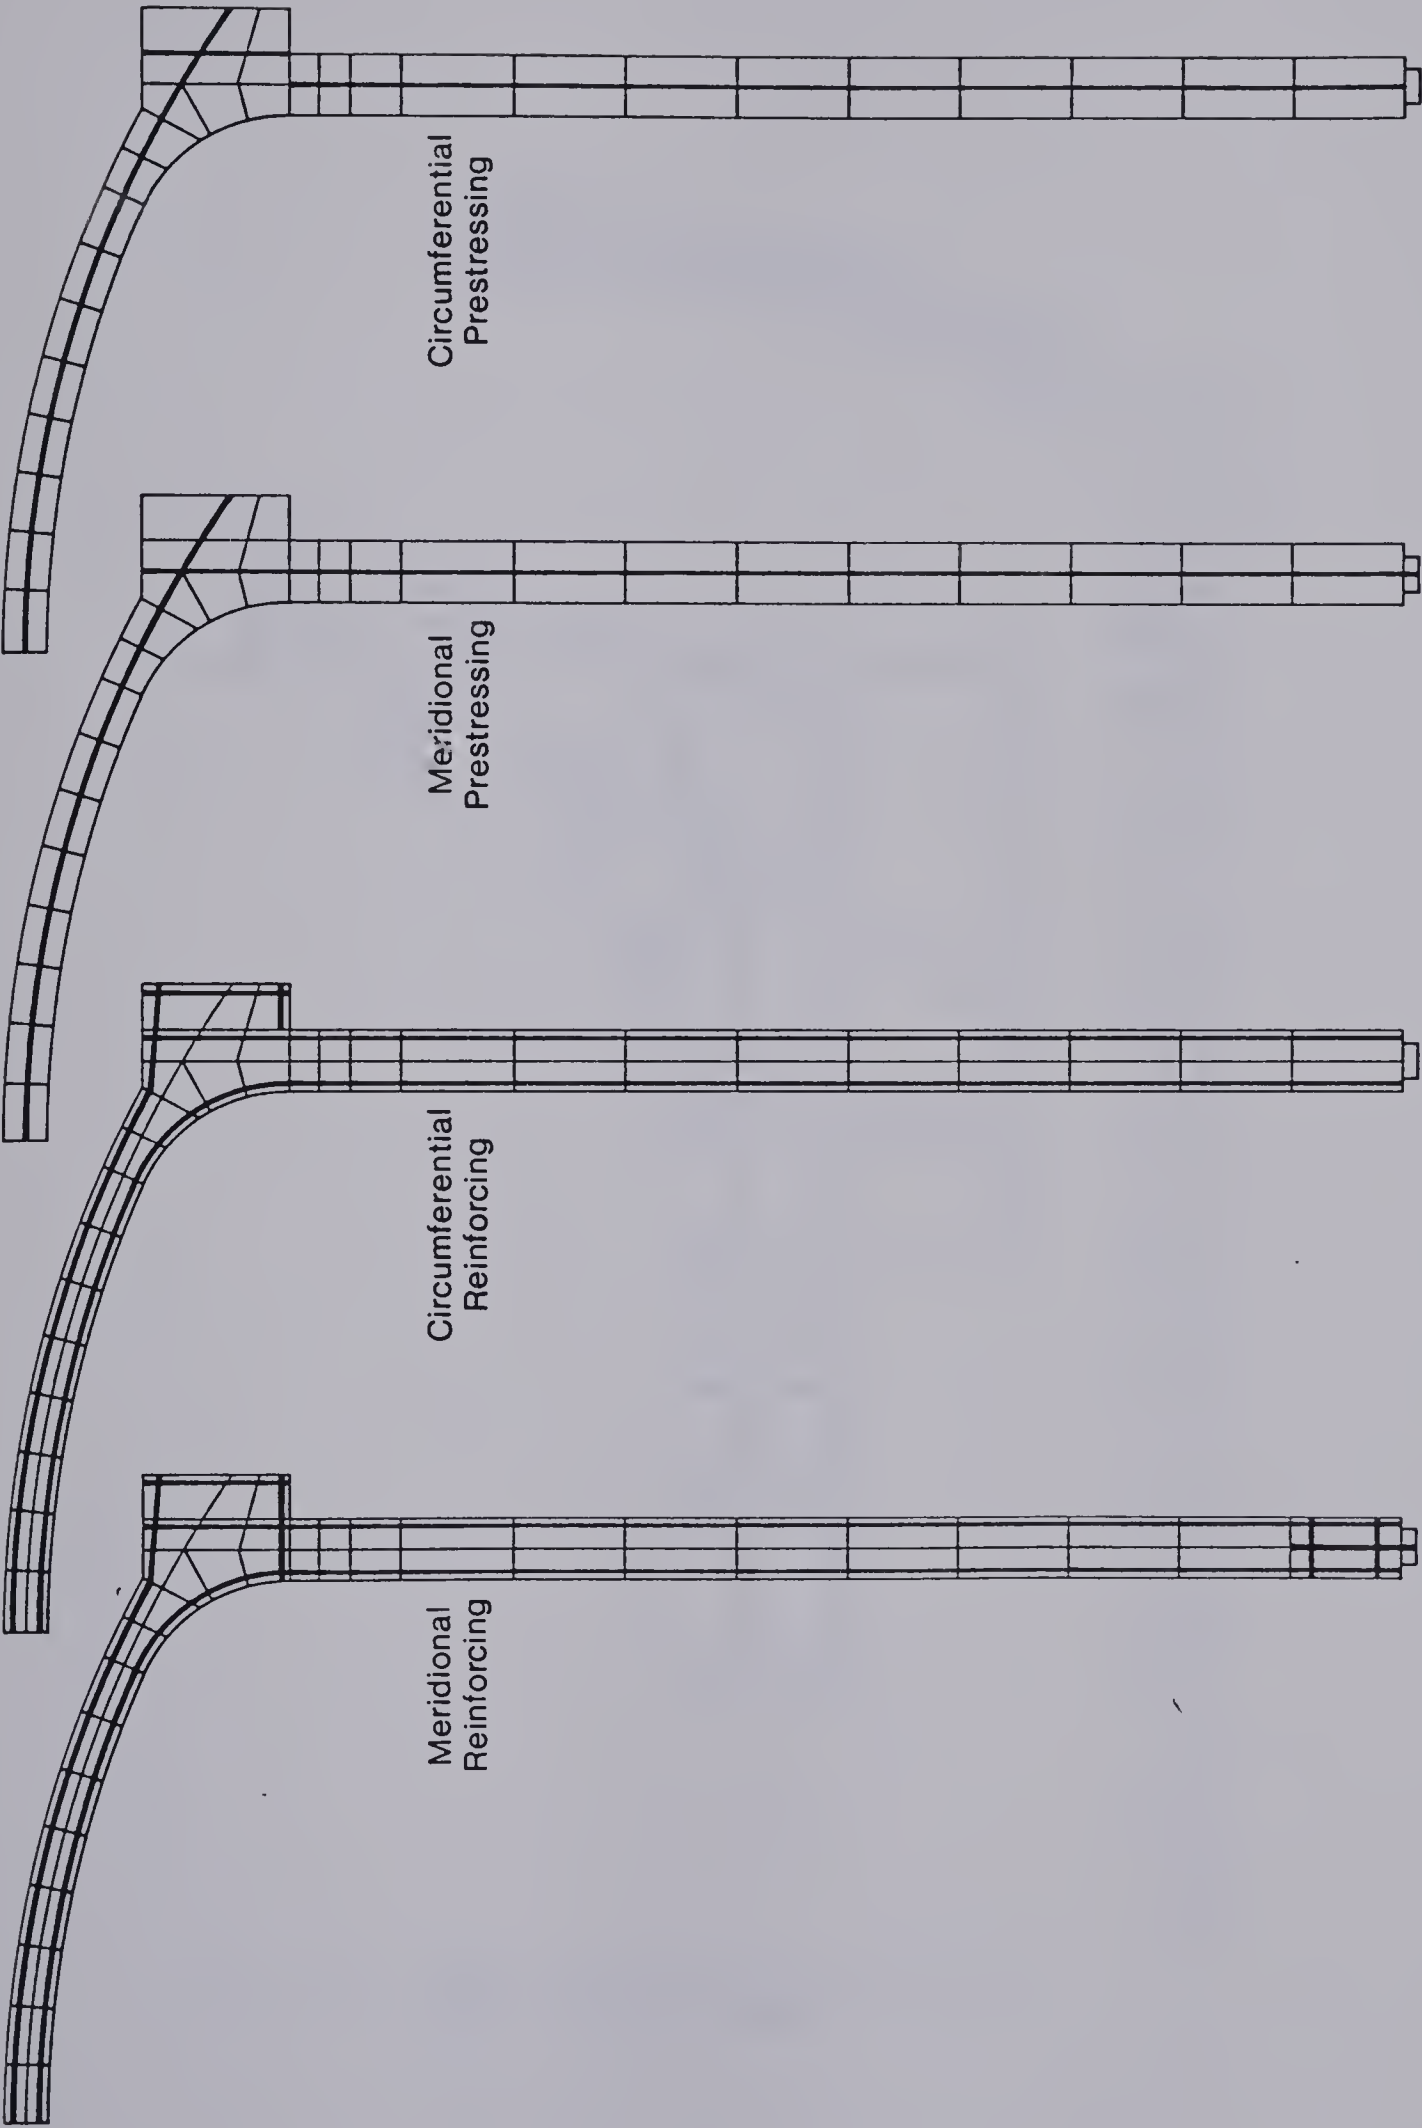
Reinforcing and Prestressing Layers of Finite Element Model of Test Structure
